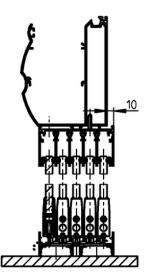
Assembly of the 3- to 5-track guide profiles below the gutter
